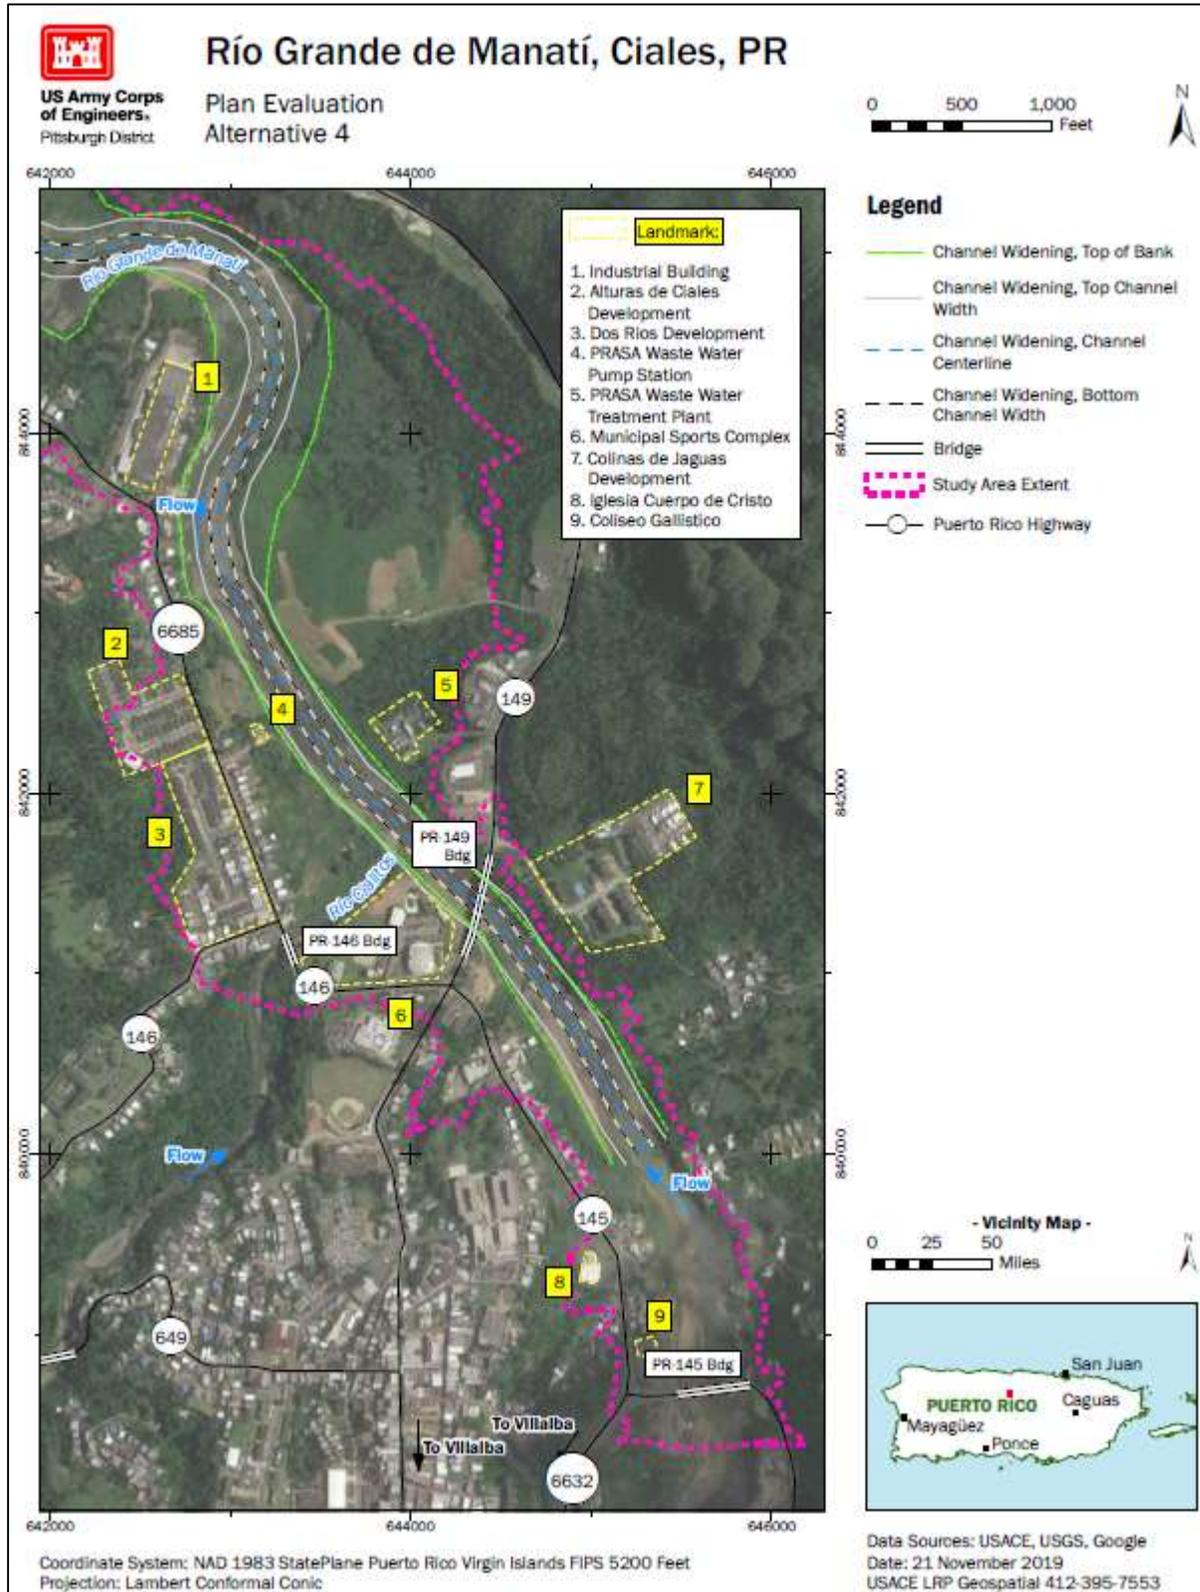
Conceptual plan view of Alternative 4 (Channelization).
